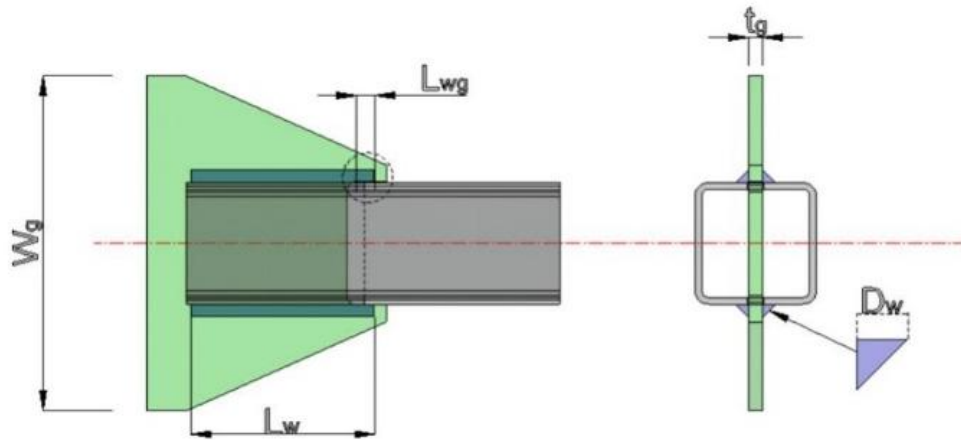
Details of Slotted HSS brace connection (Afifi et al., 2020)
